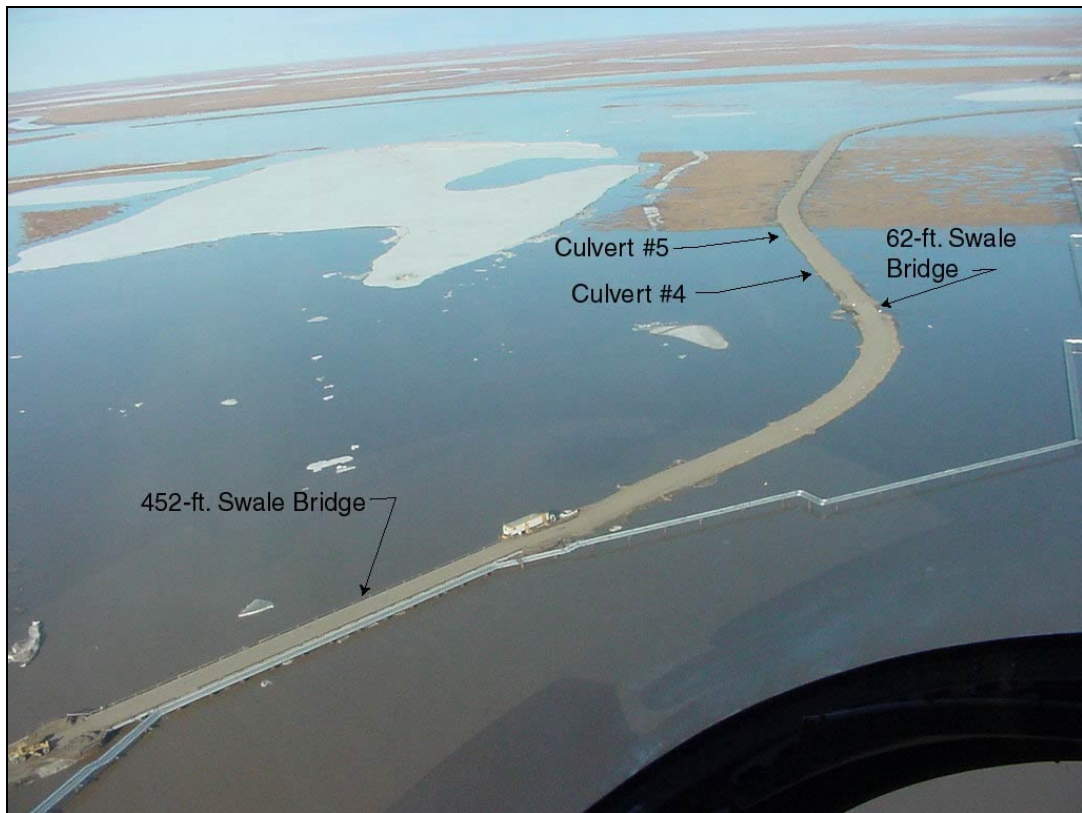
b Flooding Conditions at Alpine June 11, 2001, looking north at CD-1.
